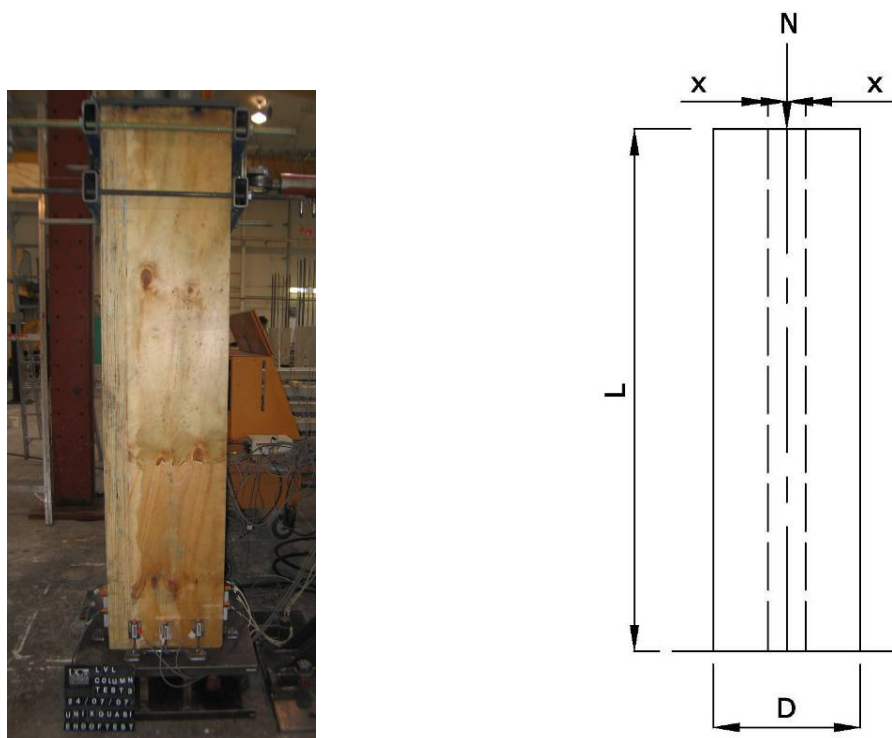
View of PT-only column a) test specimen b) with dimensions
